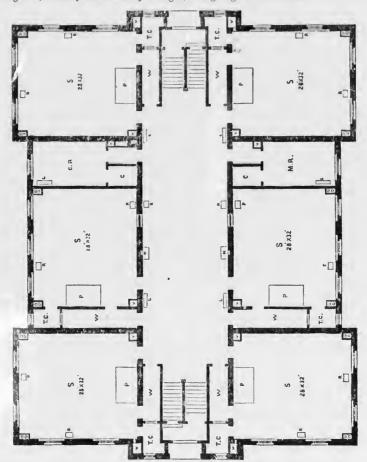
,-Plan of First and Second Floors of Design No. 53,
